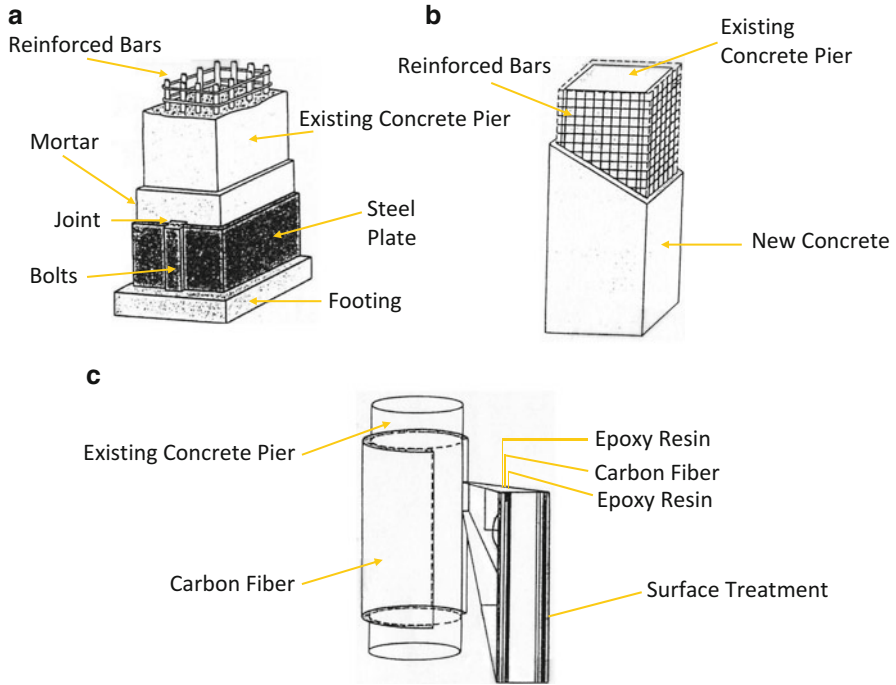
Reinforcement of concrete piers. (a) Steel plate jacking. (b) New concrete casting. (c) Carbon fiber facing
